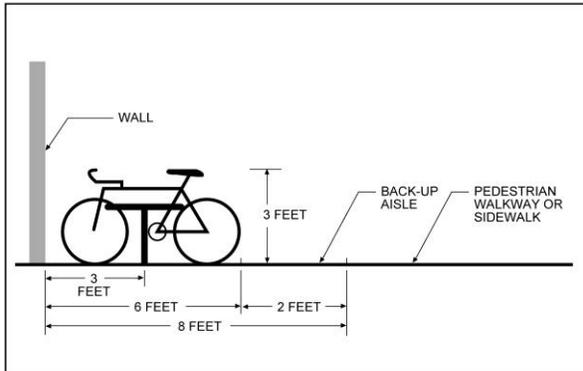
Elevation showing separation between bicycle parking and pedestrian walkways
